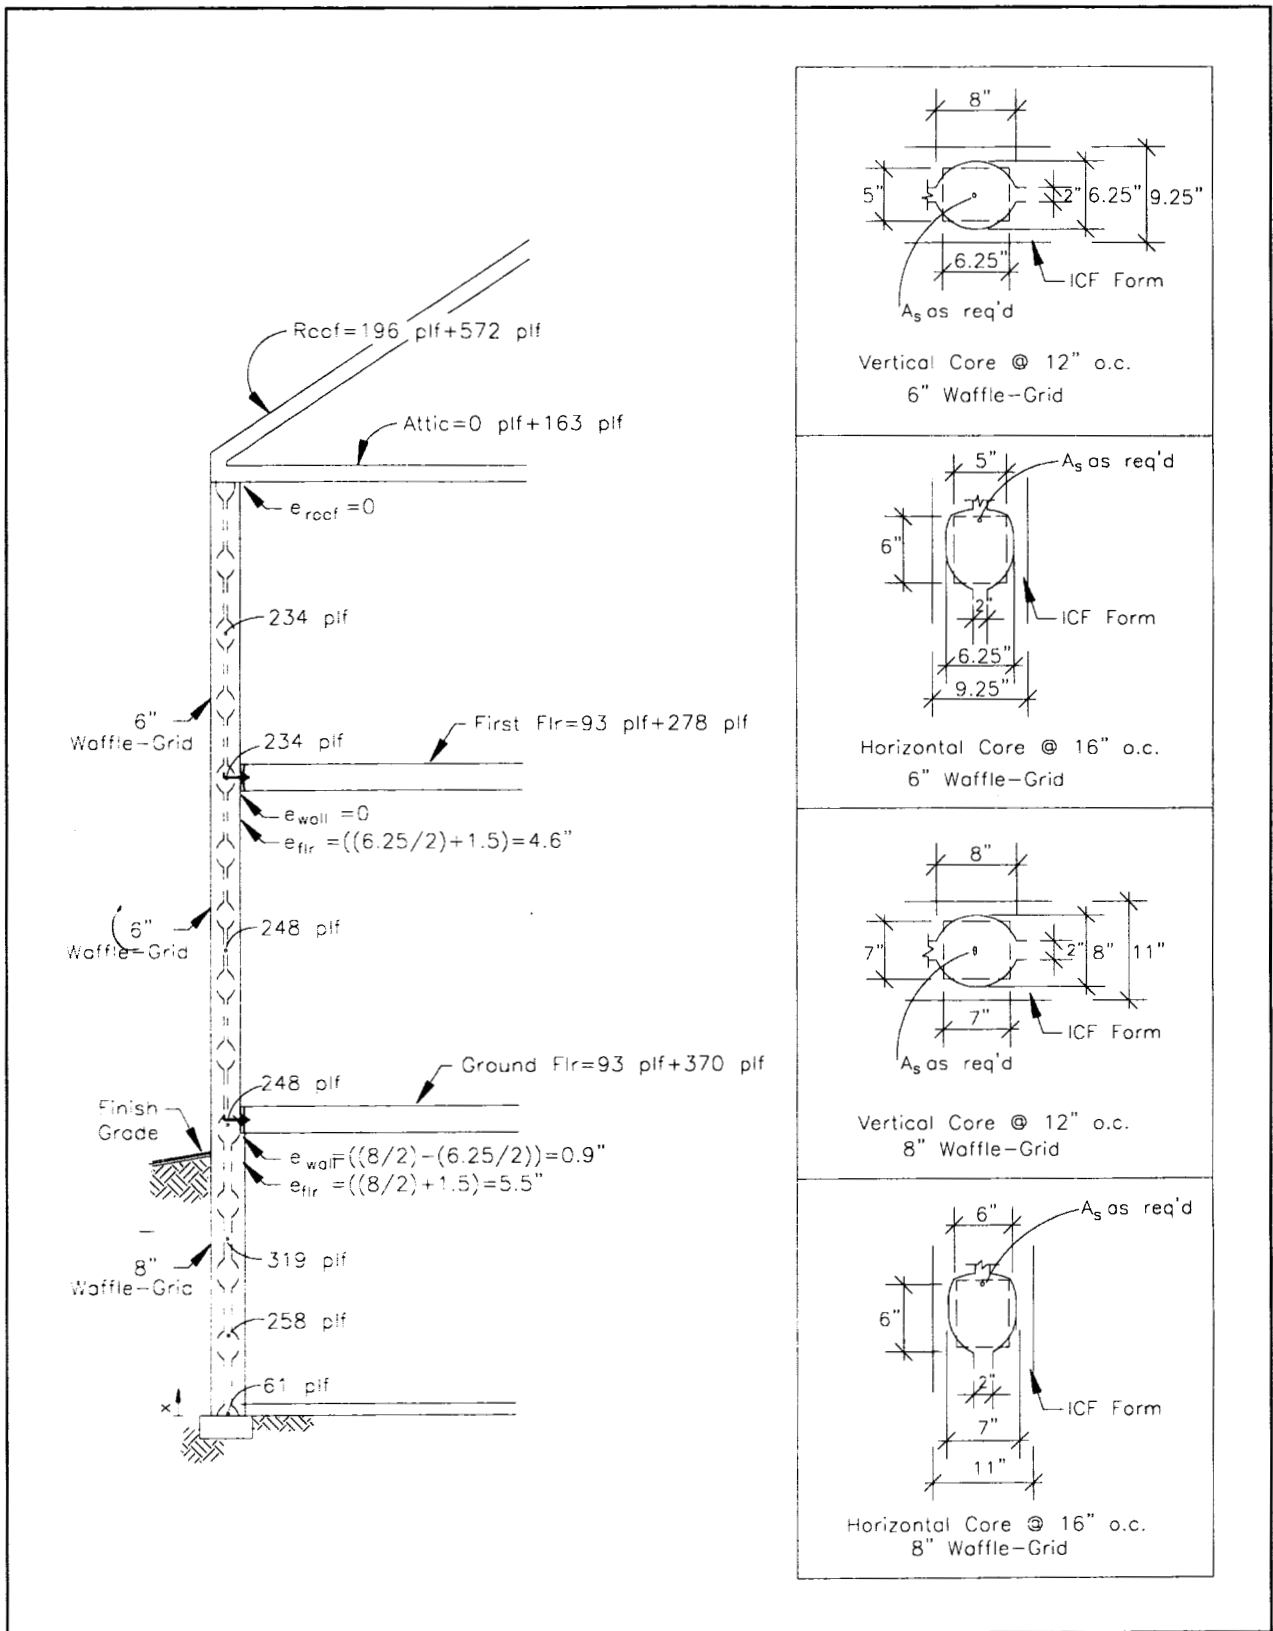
South Wall Section and Distribution of Gravity Loads
